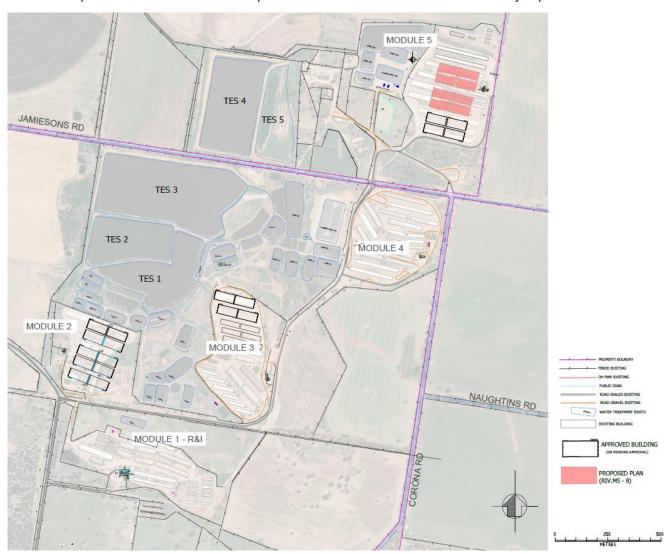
Location Plan - Replacement Sheds. Source: Rivalea, 2024
